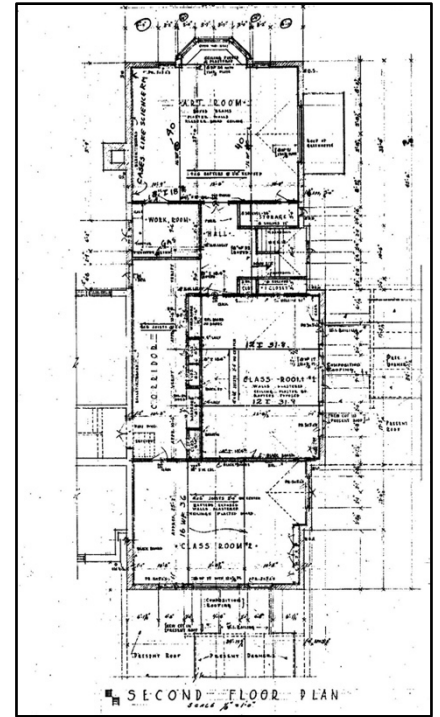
Second Floor Plan from 1937 plans showing the three new classrooms.
